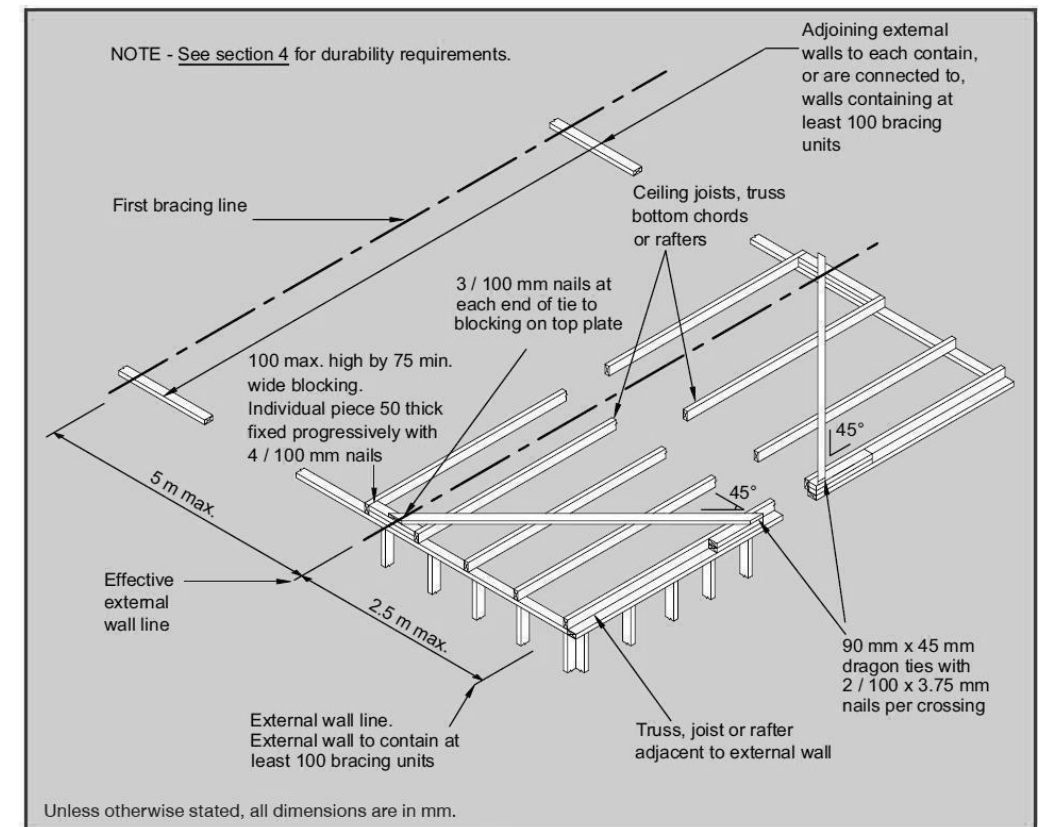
Connecting top plates to external walls at right angles – Walls containing bracing (see 8.7.3.4)
